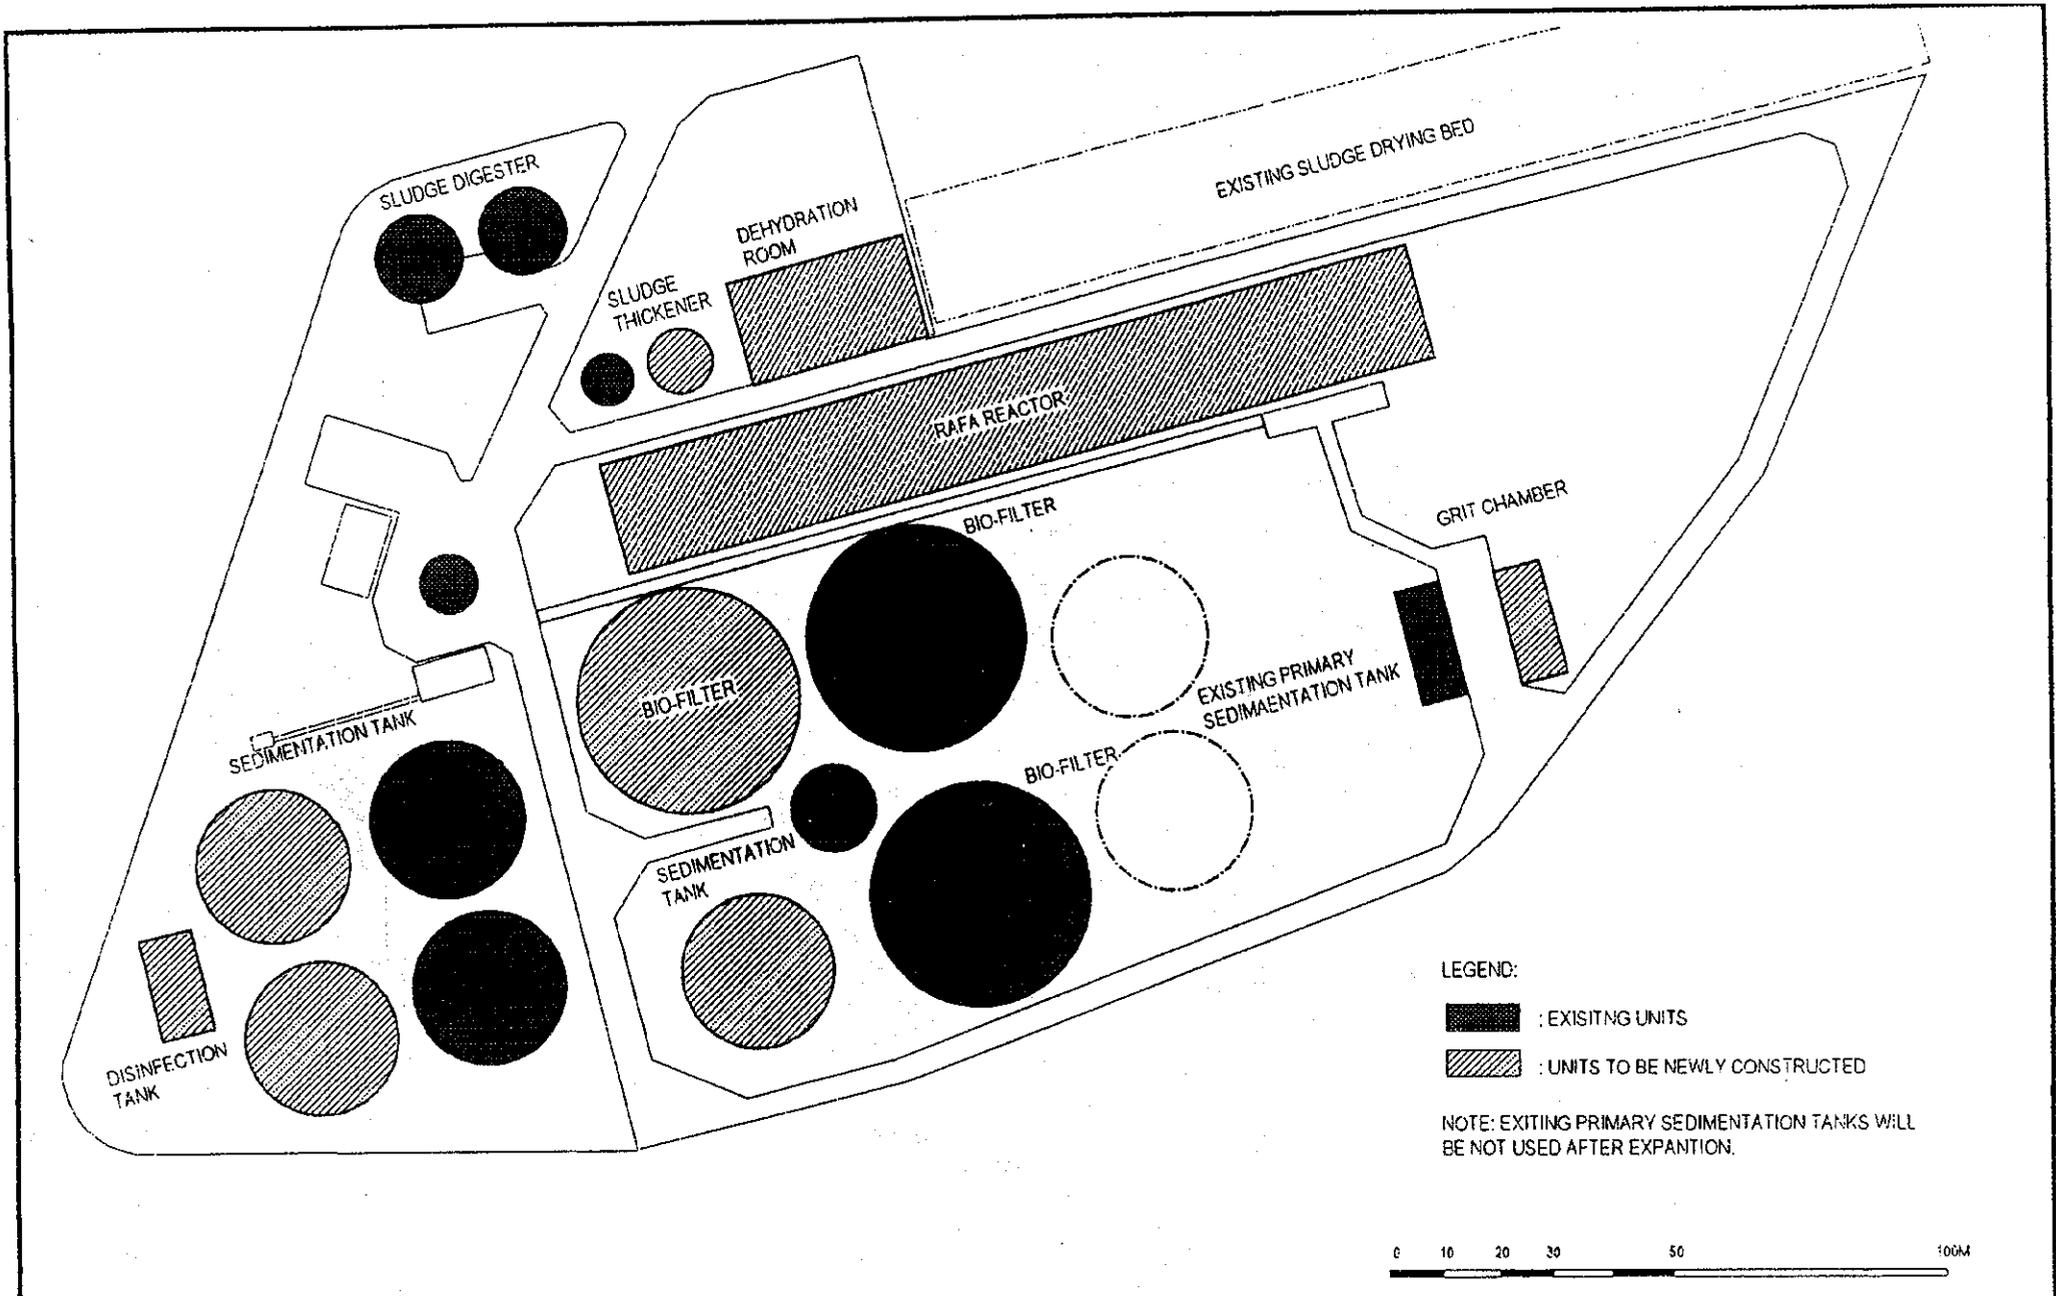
Layout Plan of Peixinhos Treatment Station
